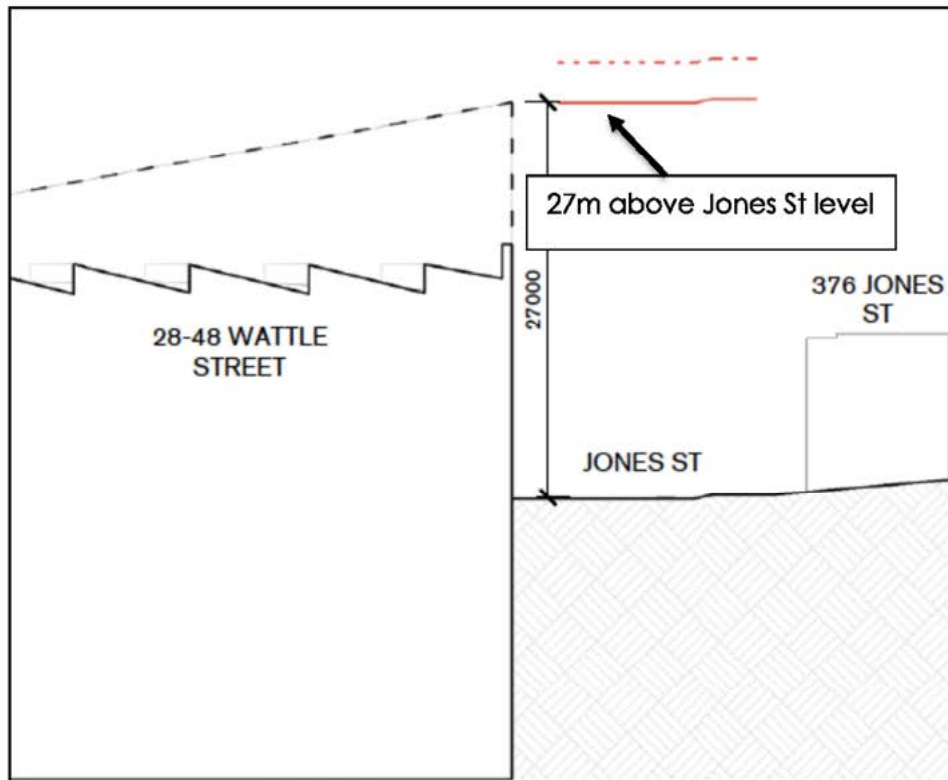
Section of Jones Street showing proposed envelope and site at 2A Allen Street.
